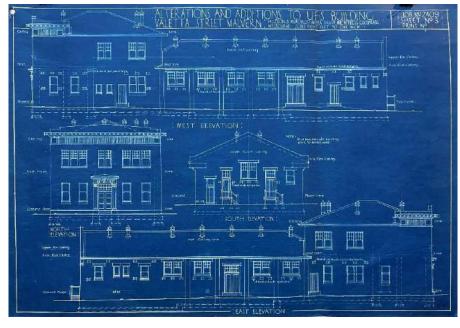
Architectural drawings showing alterations and additions to UFS Building, Valetta Street by Hudson and Wardrop, c1924 (SHC MB3357)
